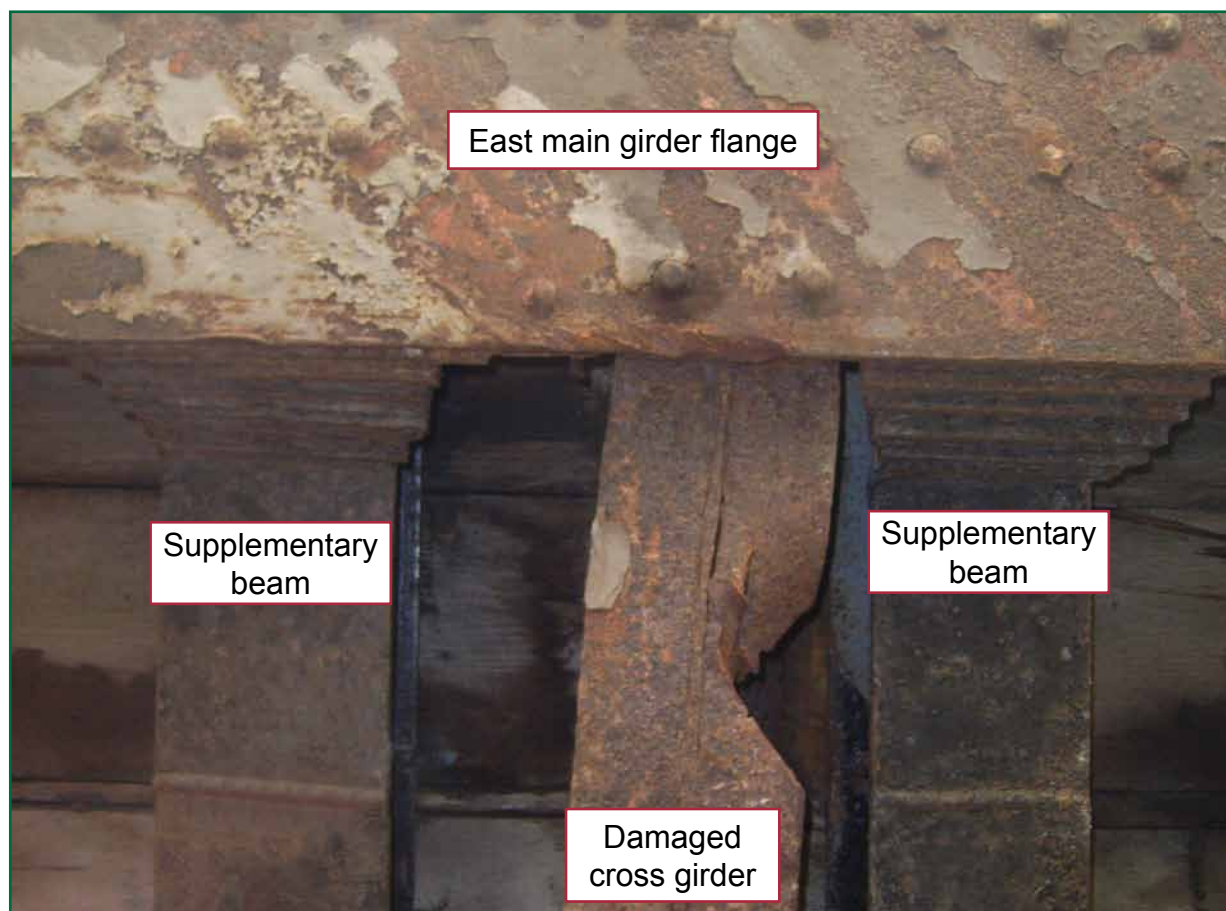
Repair done in 2004 to supplement cross girders damaged by vehicle strikes
